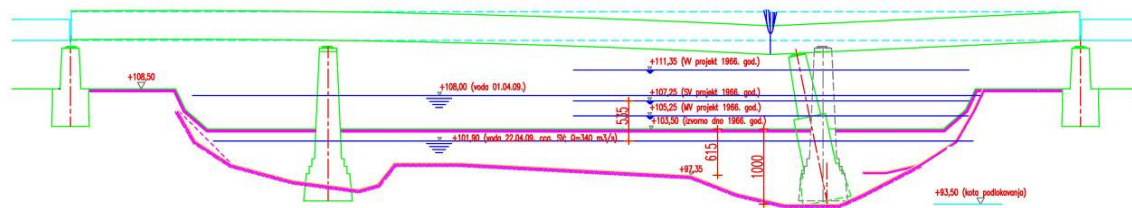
The cross section of the railway bridge Jakuševac that collapsed in 2009
